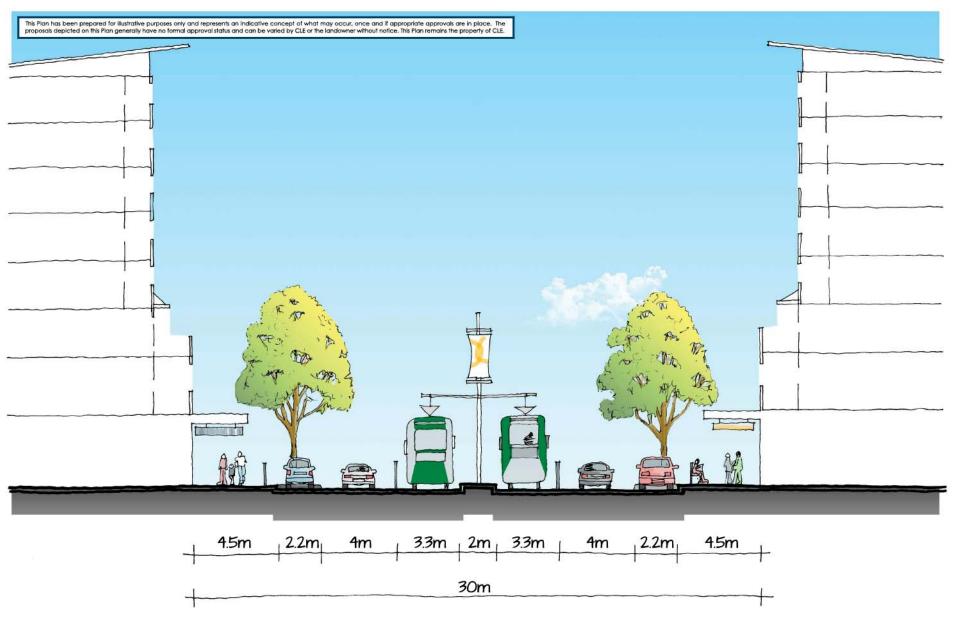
EAST-WEST TRANSIT STREET CROSS SECTION
